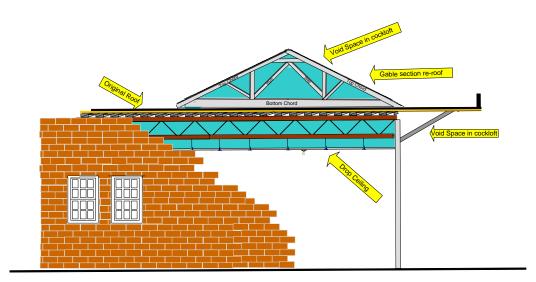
When a second roof is placed over an existing roof, there are numerous void spaces where fires can burn undetected for long periods of time and cause considerable damage.
